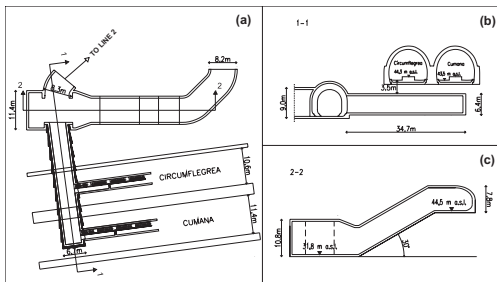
Pedestrian tunnel views: (a) plan; (b) section 1-1; (c) section 2-2.
